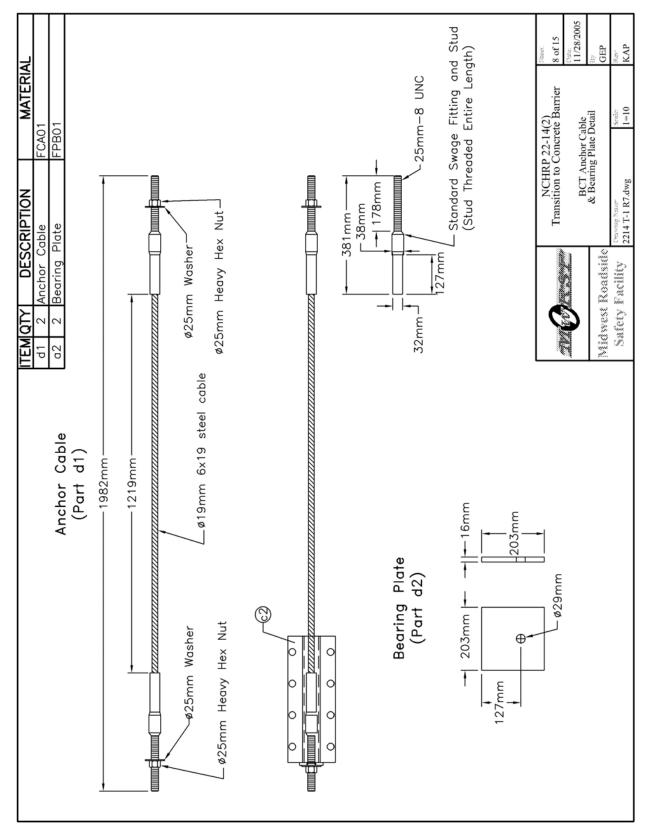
Approach Guardrail Transition to Concrete Barrier Design - Anchorage Details
